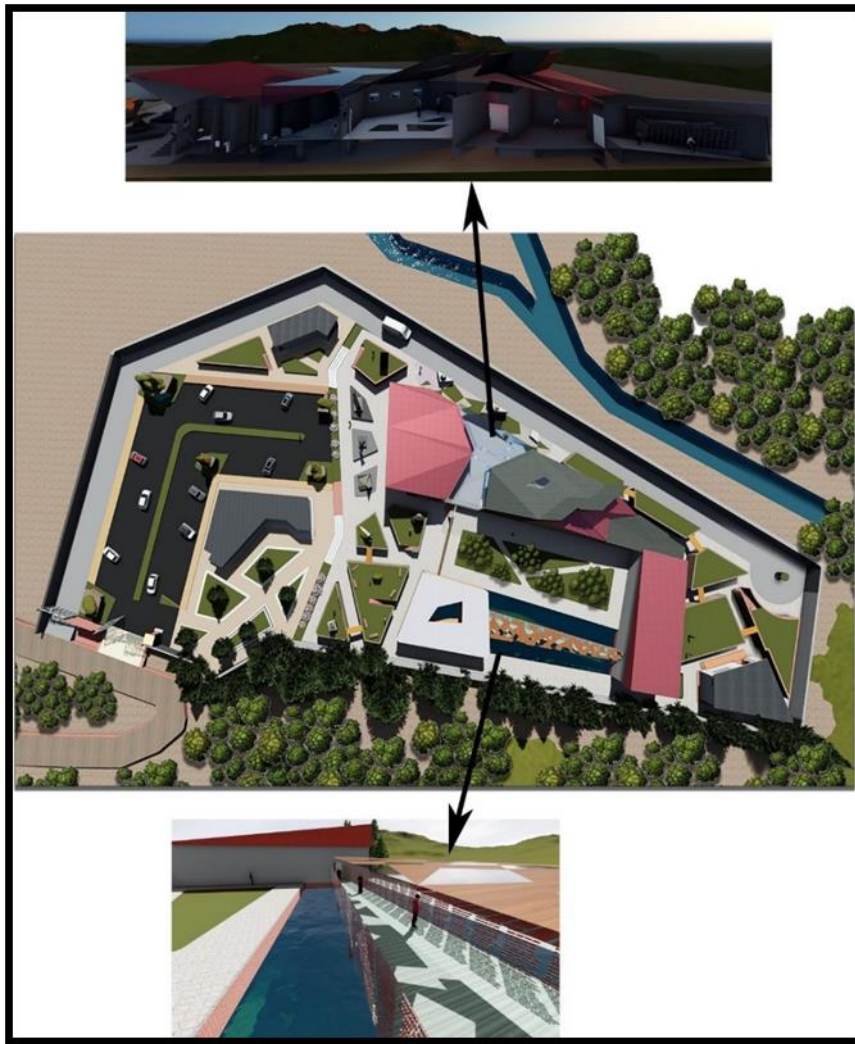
Final master Plan of project (Above arrow showing first half of museum lower arrow showing the Bridge Voyage that connects Halls of Perplexing and Anticipation)
